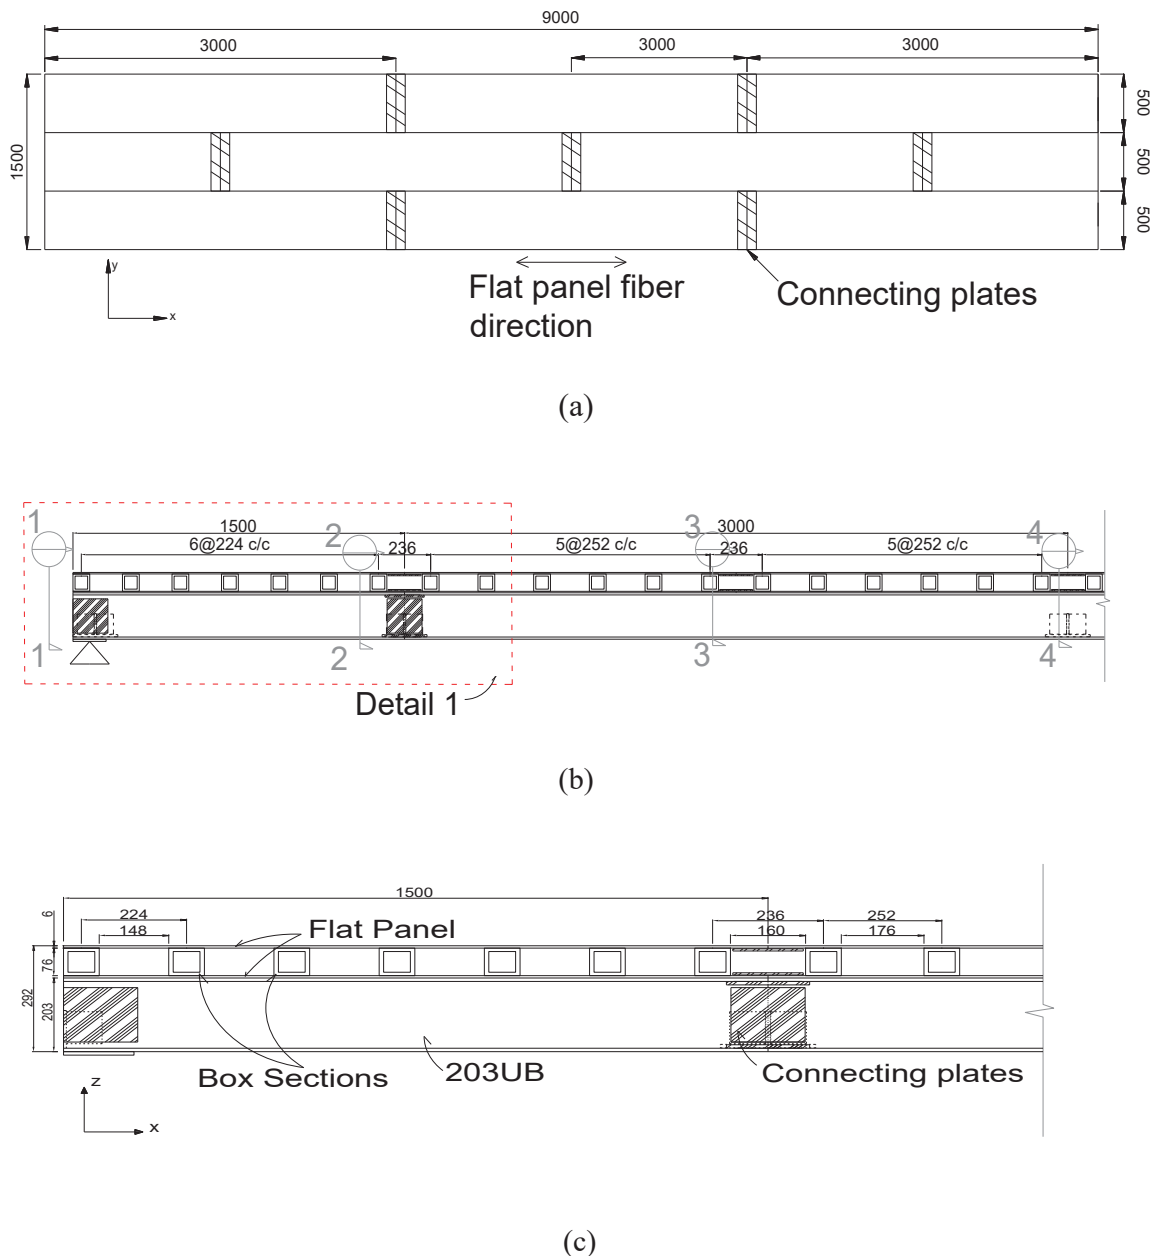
Typical dimensions of the MB showing built-up of individual pGFRP components: a) plan view; b) elevation view of MB up to midspan (same disposal from both ends), and c) closeup of Detail 1 (units: mm).
